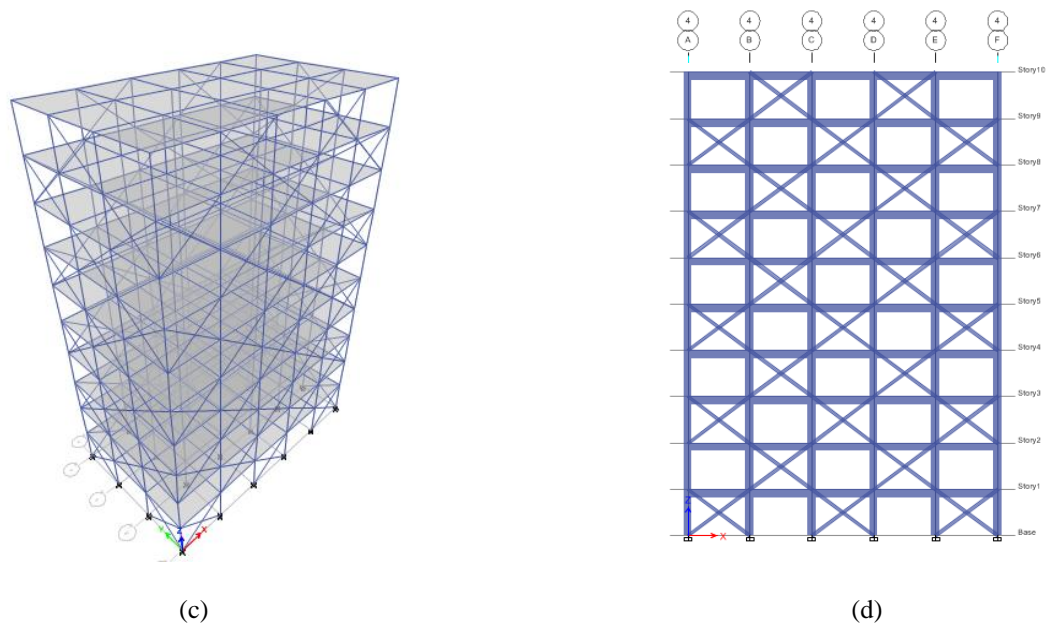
Staggered X Bracing Model (c) 3DView (d) Elevation
